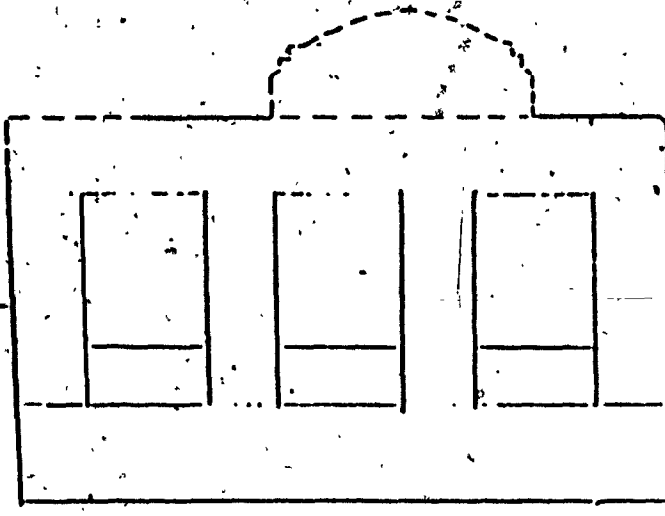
Composition of the OUTREMONT side elevation taken from Architectural plans of LE CHATEAU: C.M.A. #440-1931.
